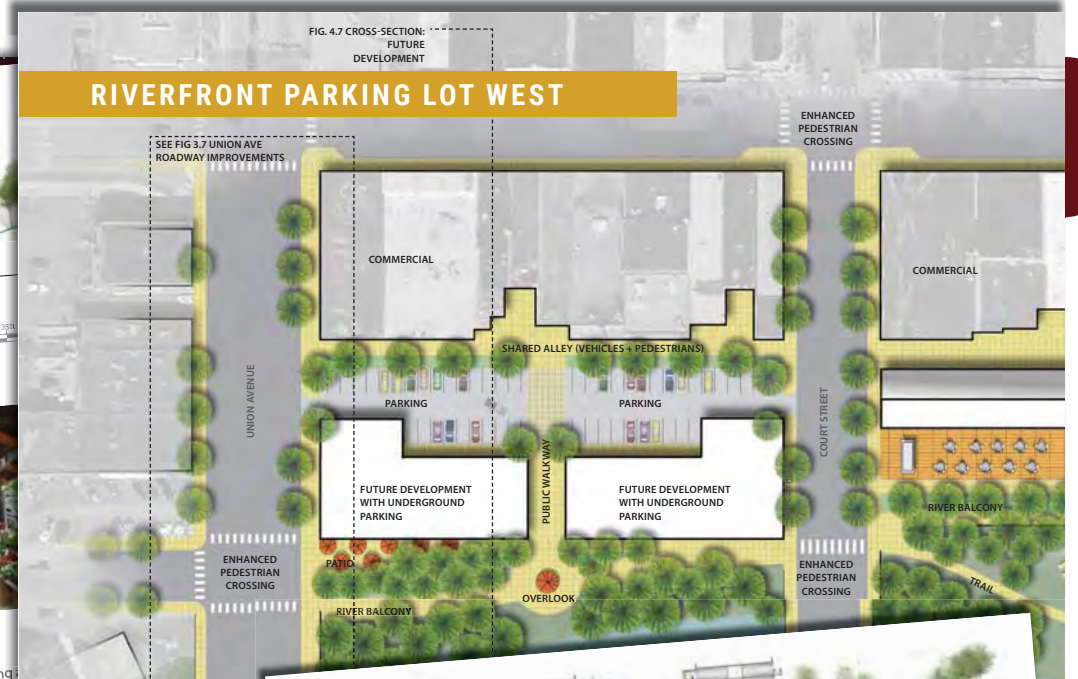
RIVERFRONT PARKING LOT WEST SITE CONCEPT
